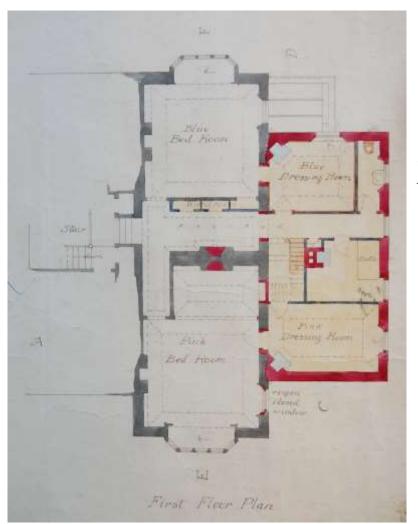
The 1899 First floor plan © The National Archive, Kew
